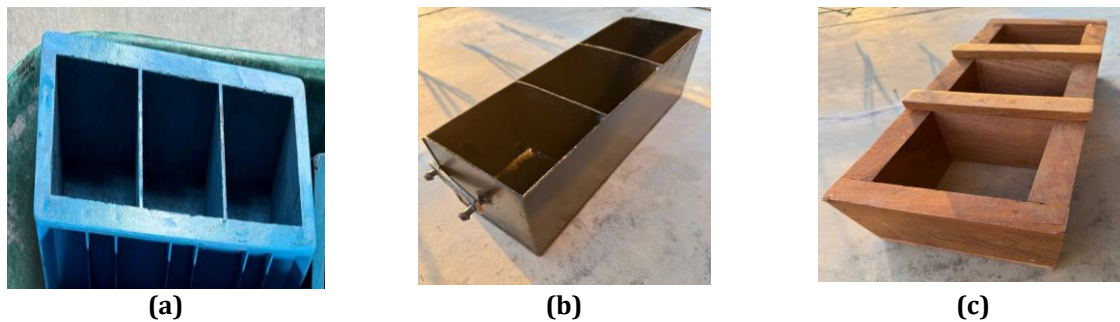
Figure description (a) Plastic formwork; (b) Steel formwork; (c) Timber formwork
